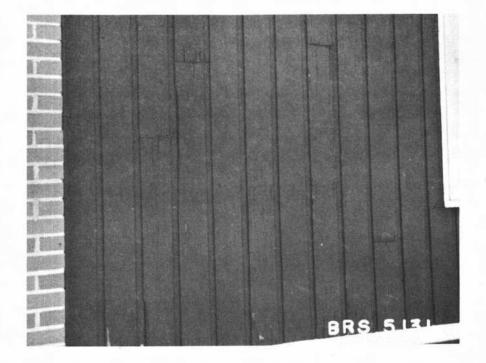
End panels of buildings at Brookdale Terrace, Cornwall, showing poor wood used in construction
